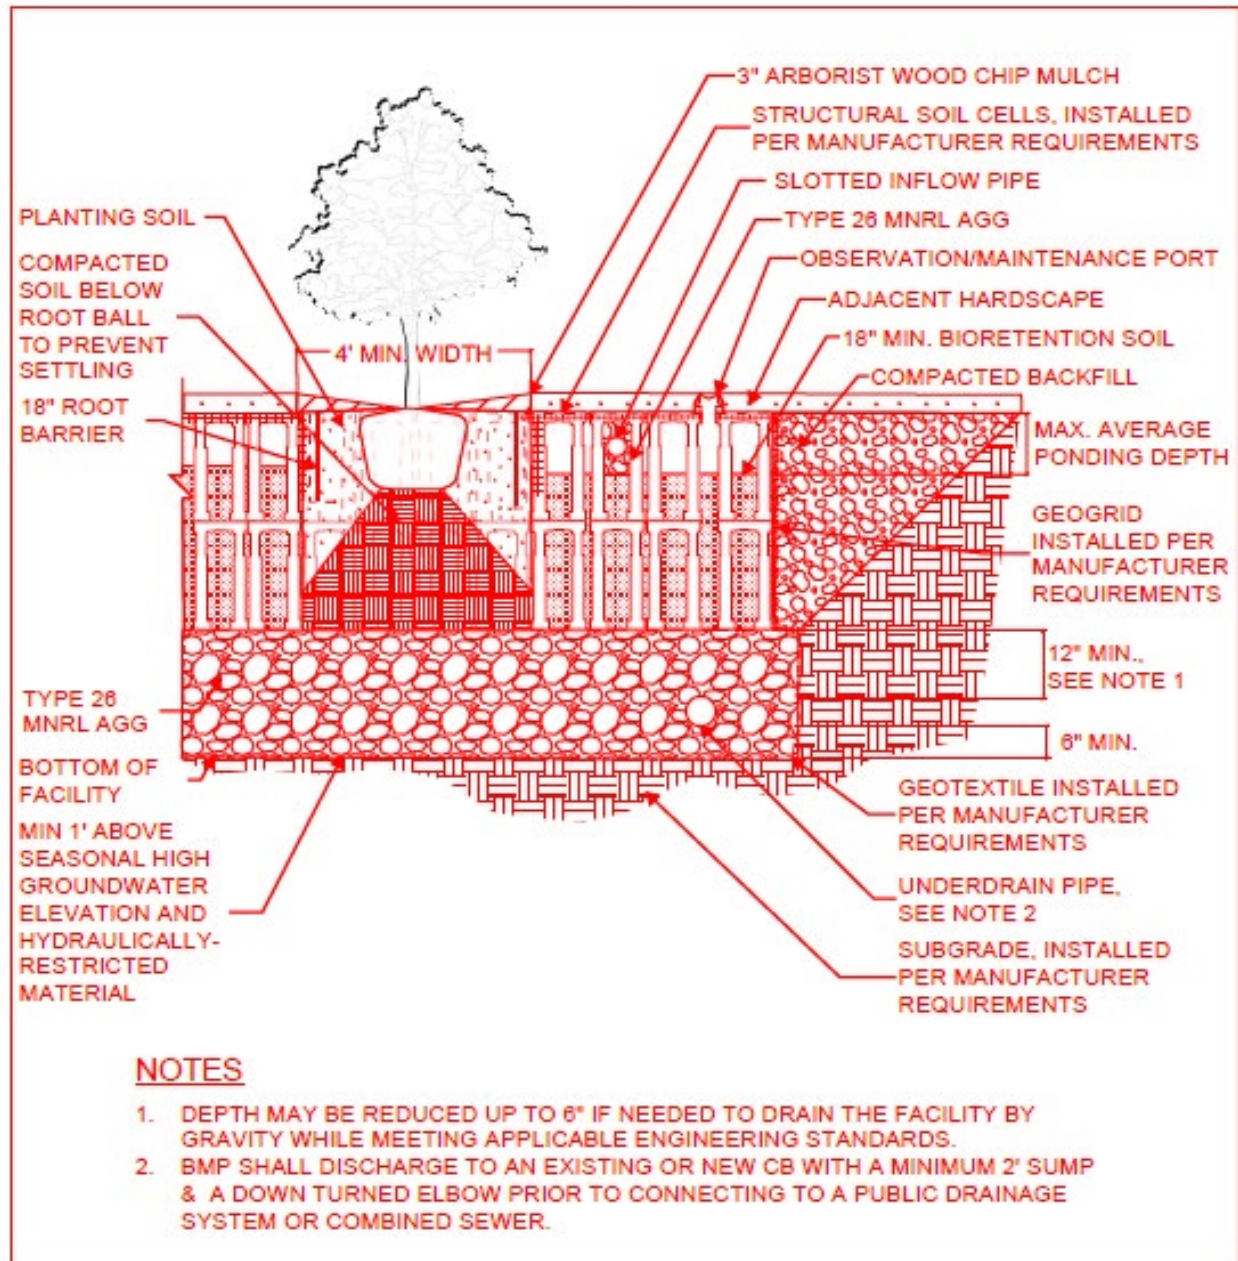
Infiltrating Structural Soil Cell BMP with Underdrain. (New Figure)
